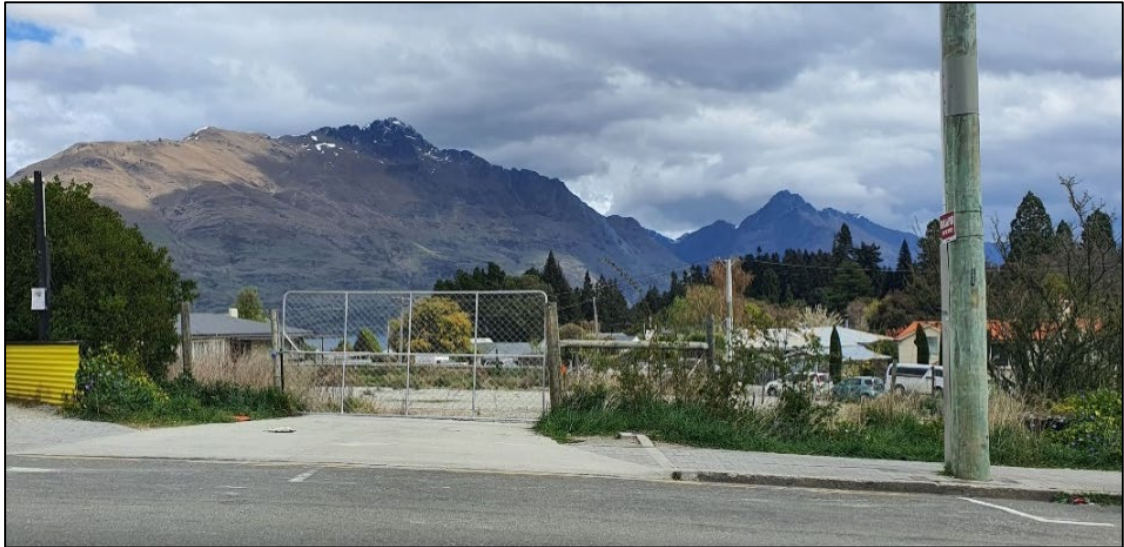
Existing facility frontage along Frankton Road (Photo Taken:10/10/2022)
